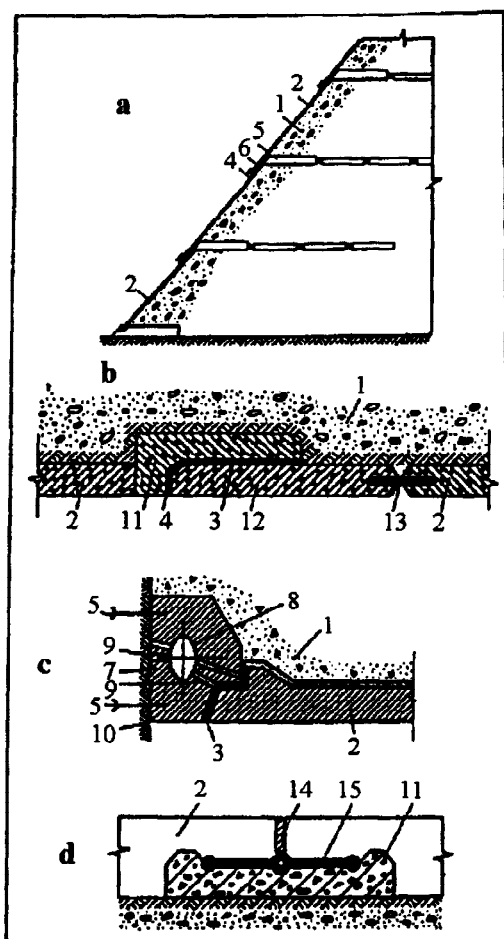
Structural designs of dams with shields; a - suspended shield; b - deformation joint with compensator; c - scheme of bank support; d - scheme of inseparated plate of shield
